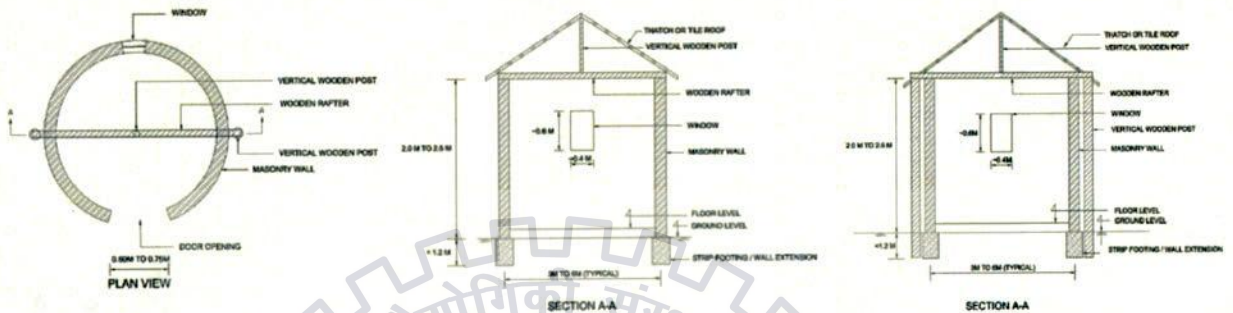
Plan and section of a typical Bhunga house (Source: World Housing Report #72)
